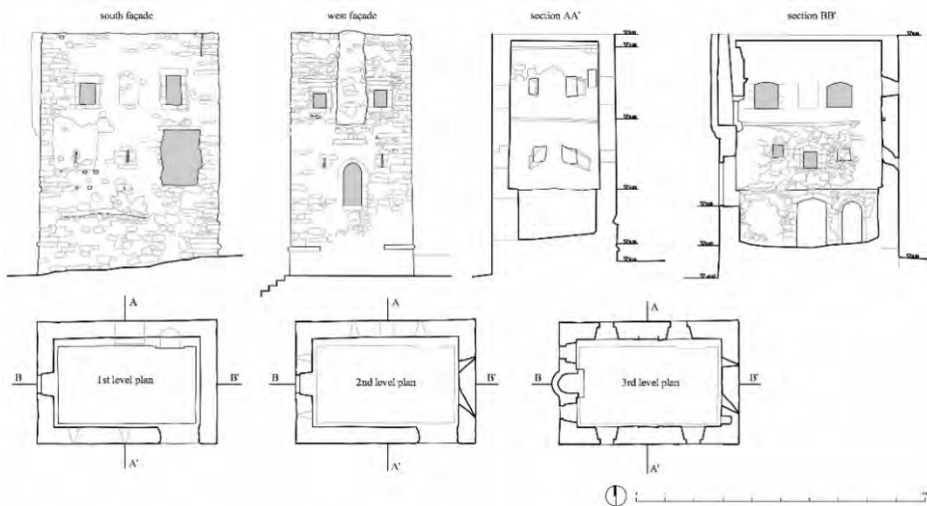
Architectural survey of the tower-house, some drawings (Emma Maglio, 2016).
